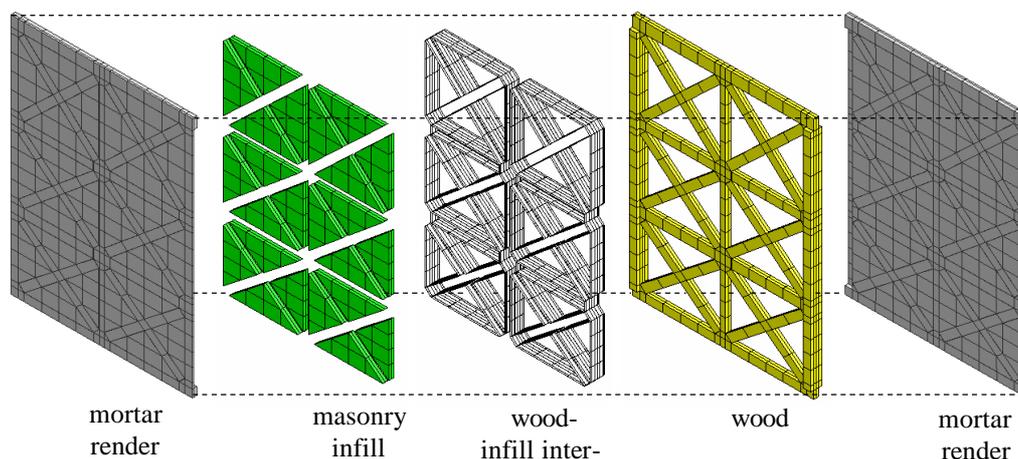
Detailed model of a timber framed panel (3365 elements).
